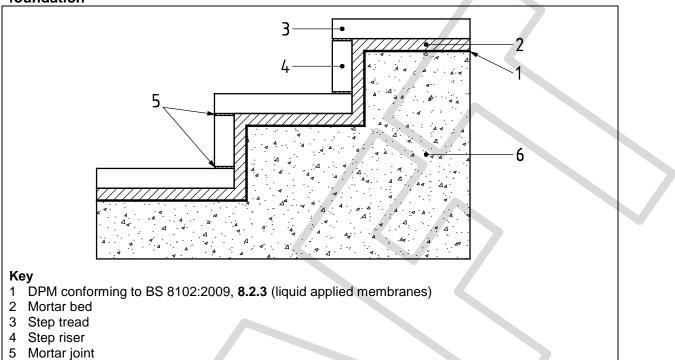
Example of a slab tread and riser step laid onto a profiled concrete foundation
